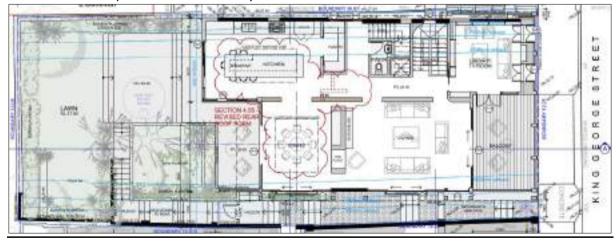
Approved First Floor Plan DA300/19/2 of 19 King George Street.
